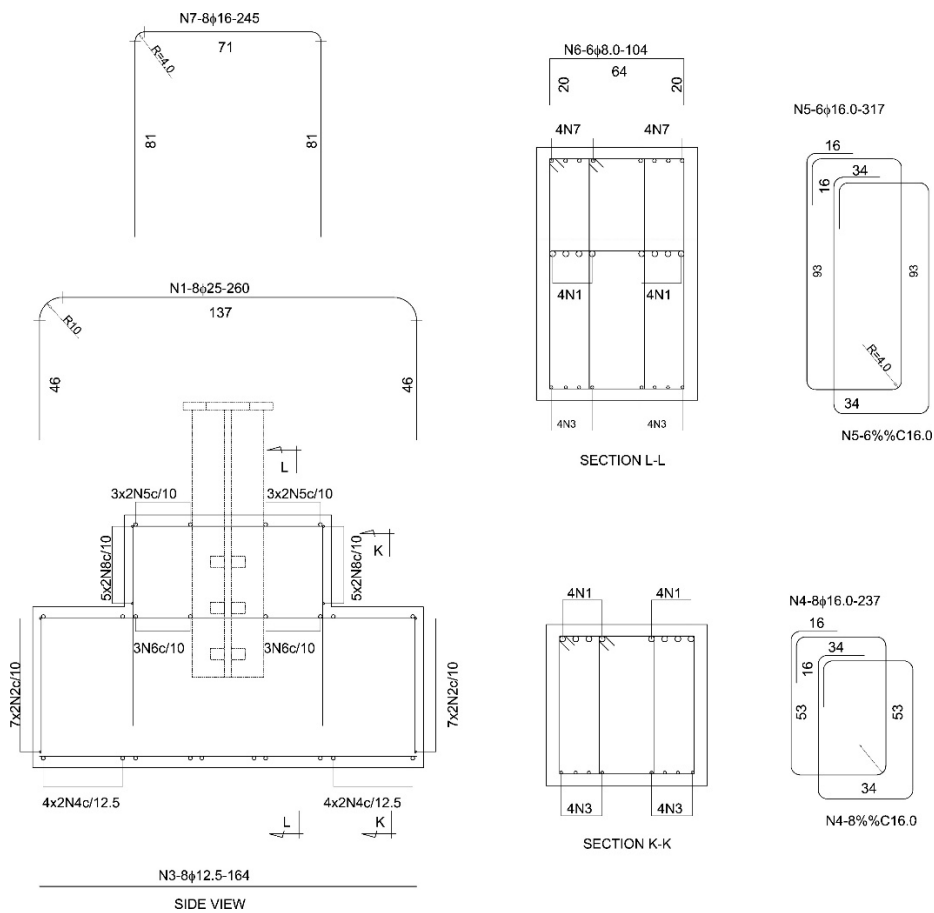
Reinforcement of the concrete block - Detailing (Part 1, dimensions in cm).
